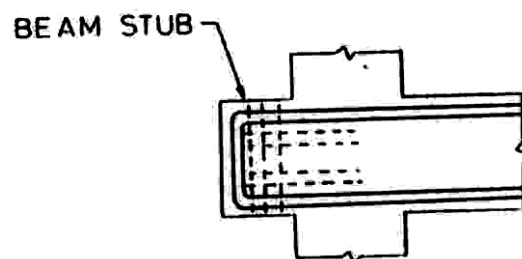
EXTERIOR BEAM STUB FOR ANCHORING BEAM BARS
